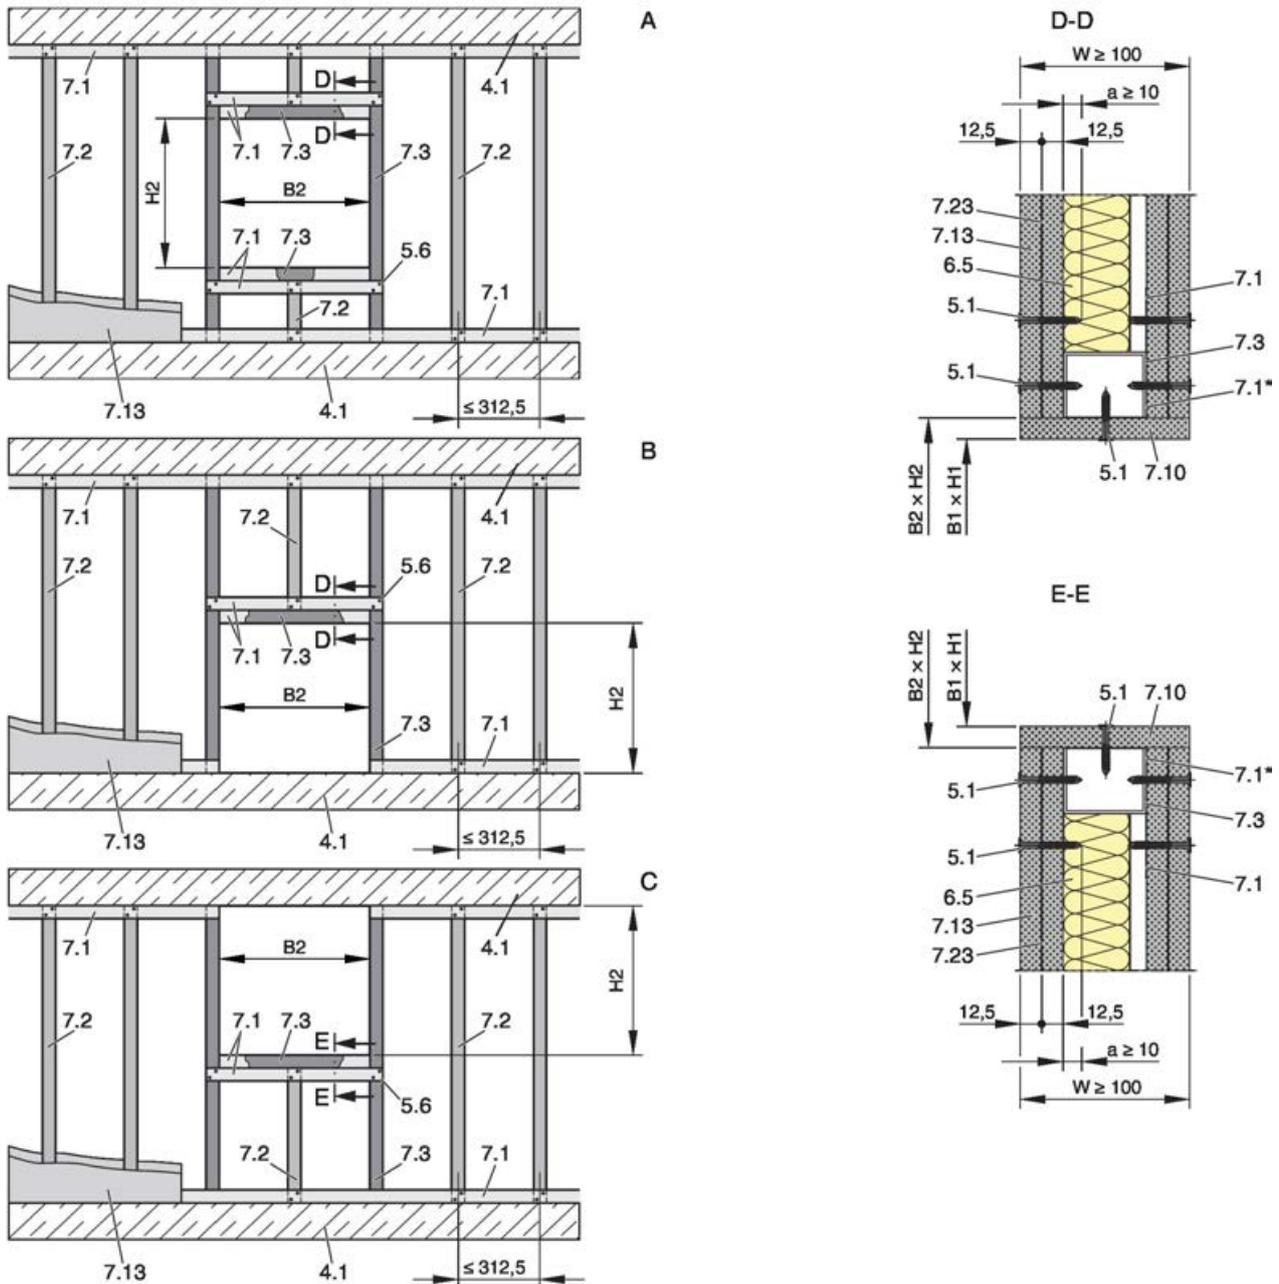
Compartment wall with metal support structure and cladding on both sides
